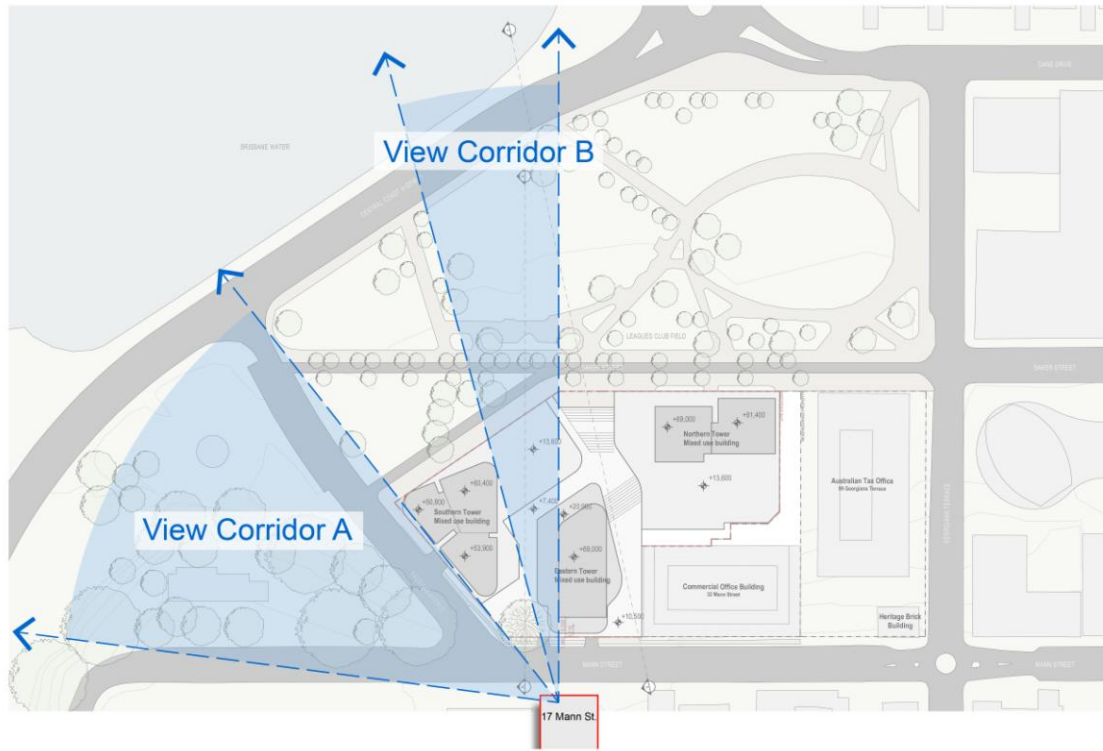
Diagram showing view corridors to Brisbane Water from 17 Mann Street proposed development
